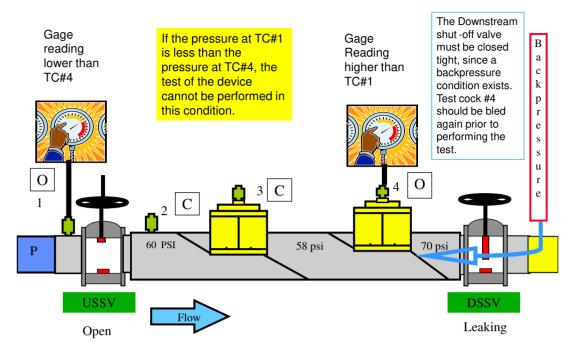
Double Check Valve Assembly Test—Backpressure Condition
